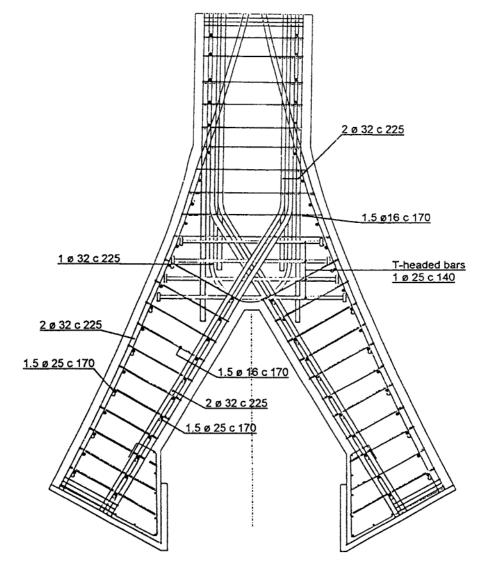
Reinforcement in Y-shaped test specimen. Sleipner A2
